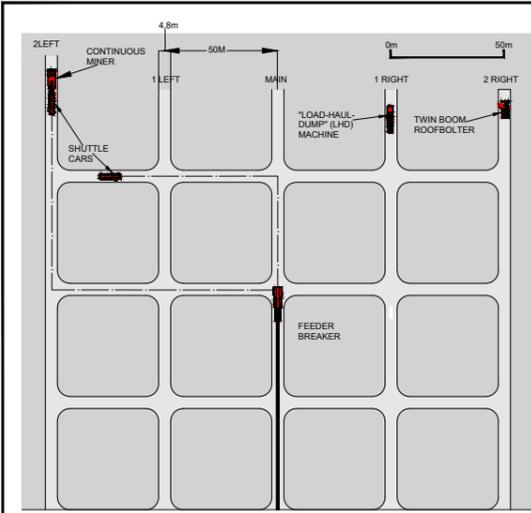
ENTRY MECHANISED ROOM & PILLAR LAYOUT
